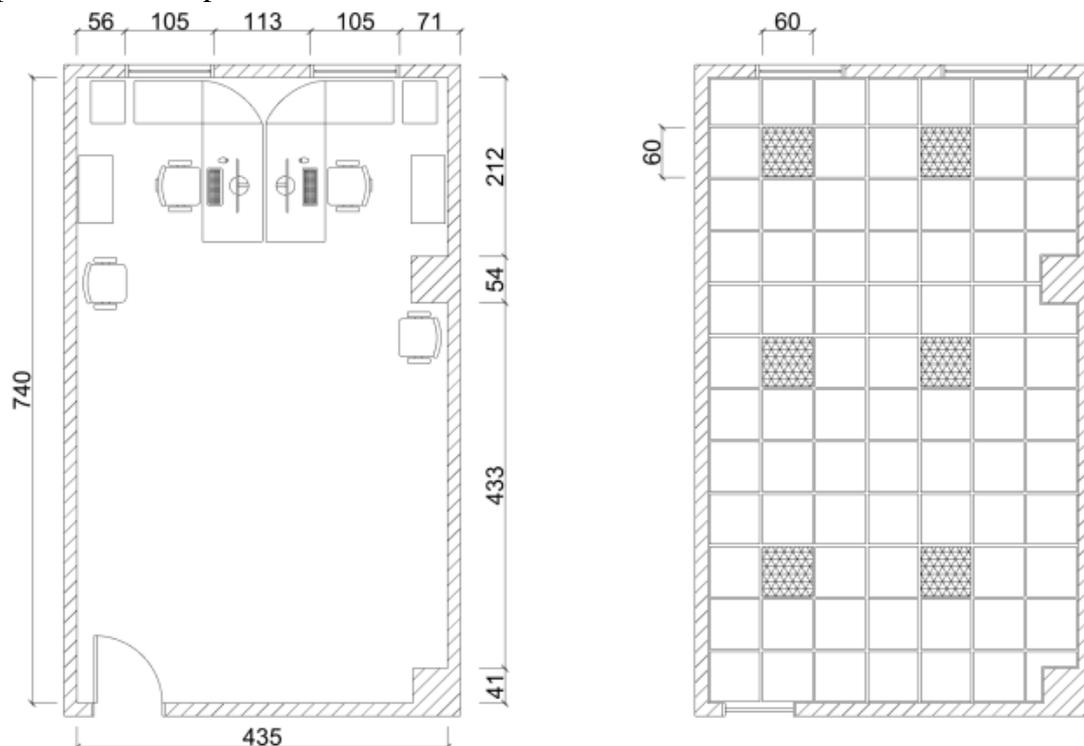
Views showing the floor plan and reflected ceiling plan of the experiment environment.
